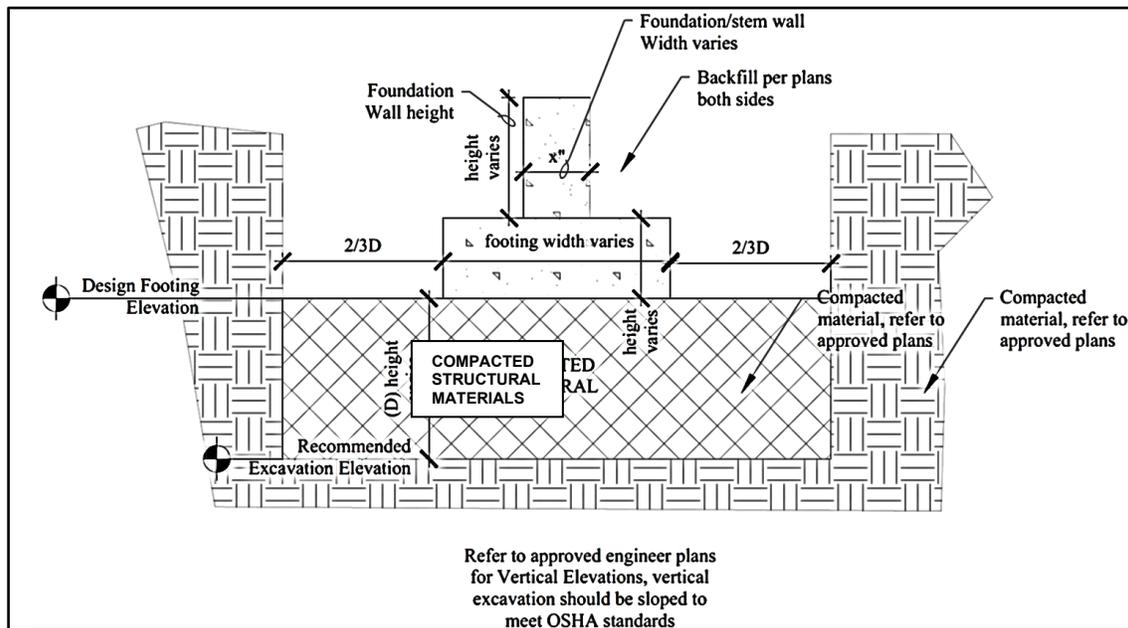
Foundation Trench Backfill Detail for Approved Soil Fill
